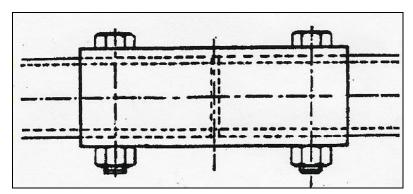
SCCA Spec. Drawing for Slip Joint and Removable Diagonal
